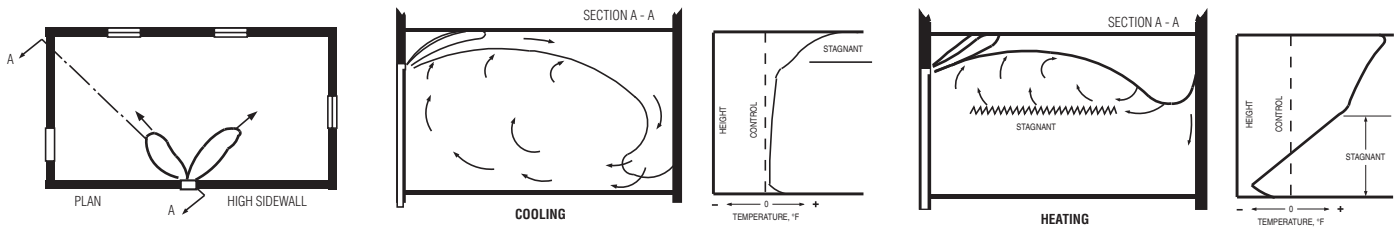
Spreading Horizontal Projection at Ceiling Level. High Sidewall Grille.
